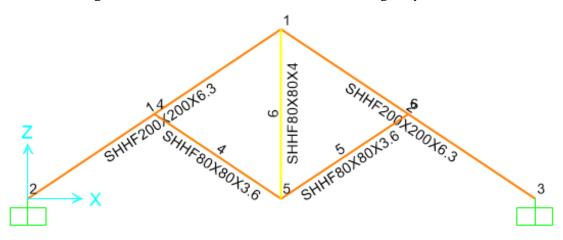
SAP 2000 model and section sizes of the original pitched truss
